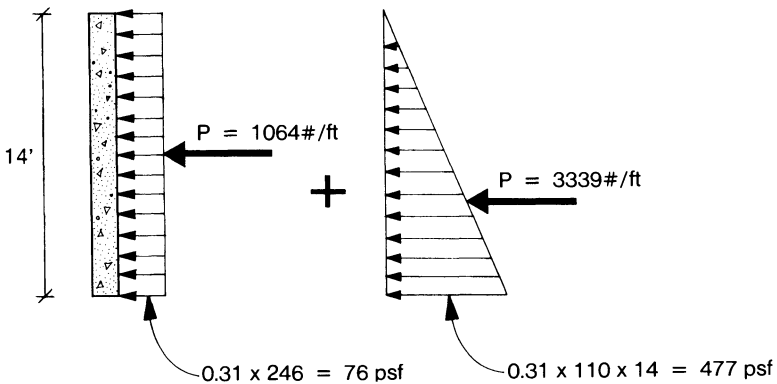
Example 9-4—Lateral pressure with sloping backfill.
